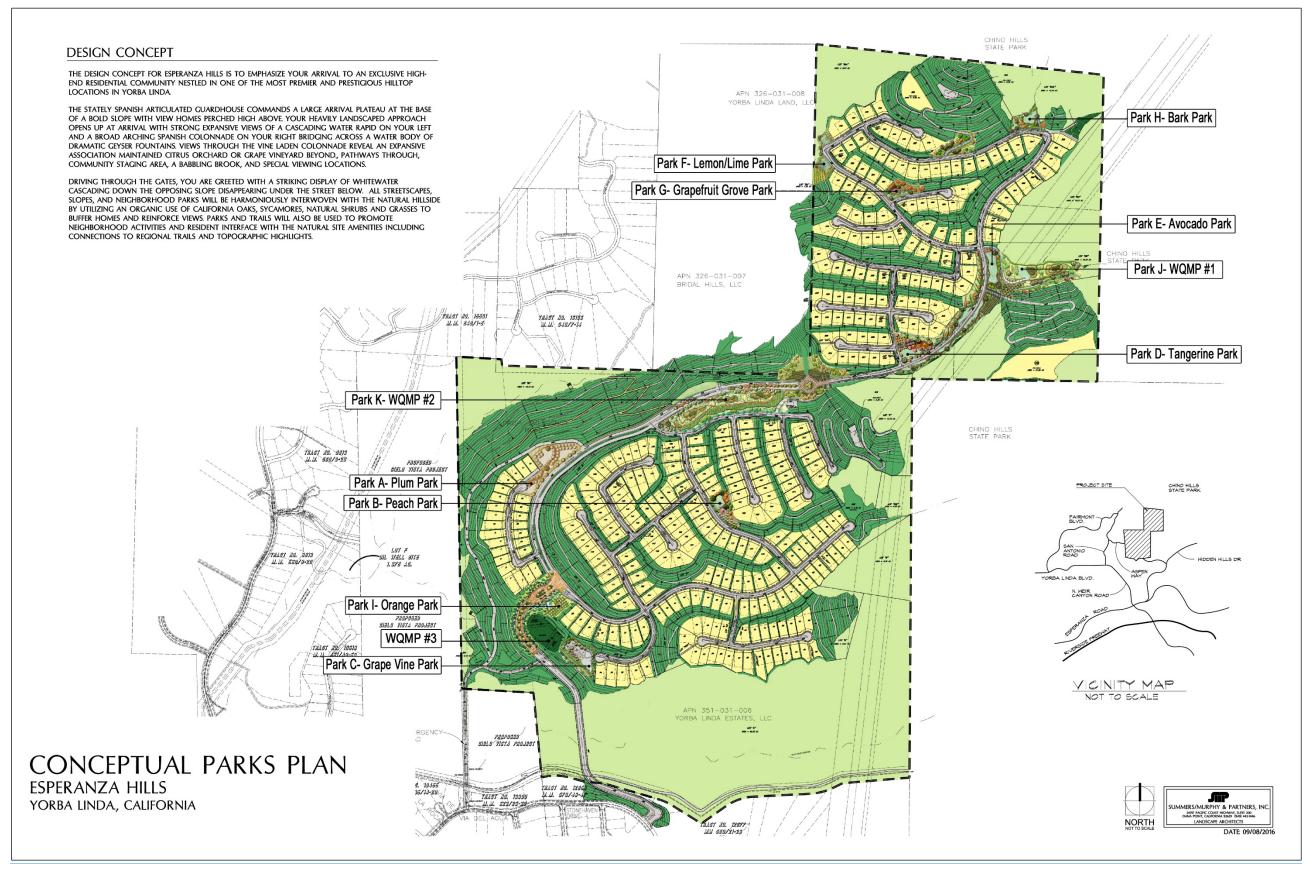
Exhibit 13 - Conceptual Parks Plan, San Antonio Road Access Configuration
